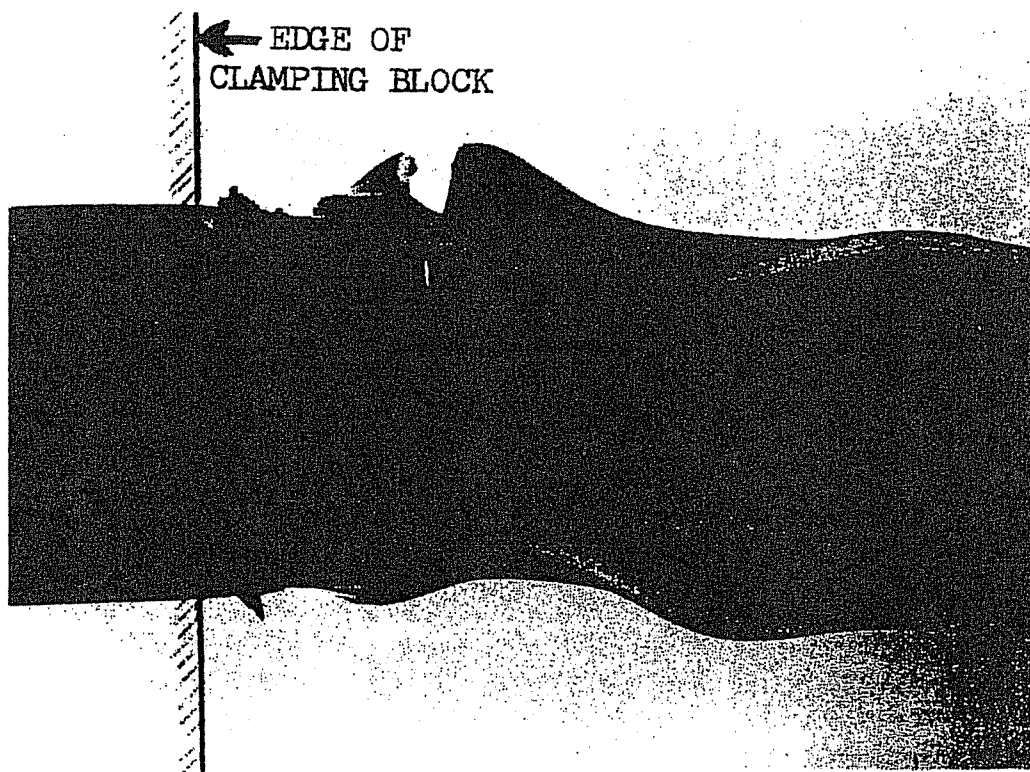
SPECIMEN NO. 10 AFTER TEST
